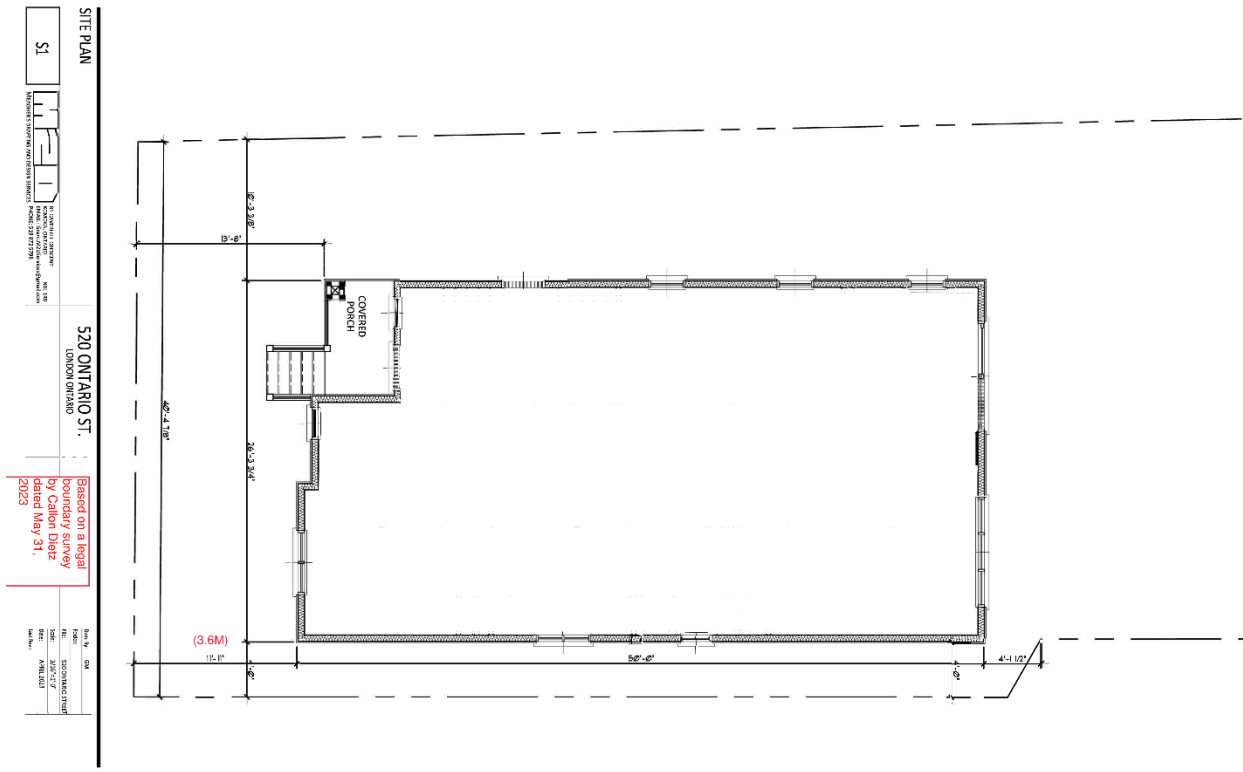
Site Plan for proposed house on the subject property at 520 Ontario Street, Meaghers Drafting and Design Services, dated June 2023. Note the 3.6m (11'11") setback of the proposed house.
